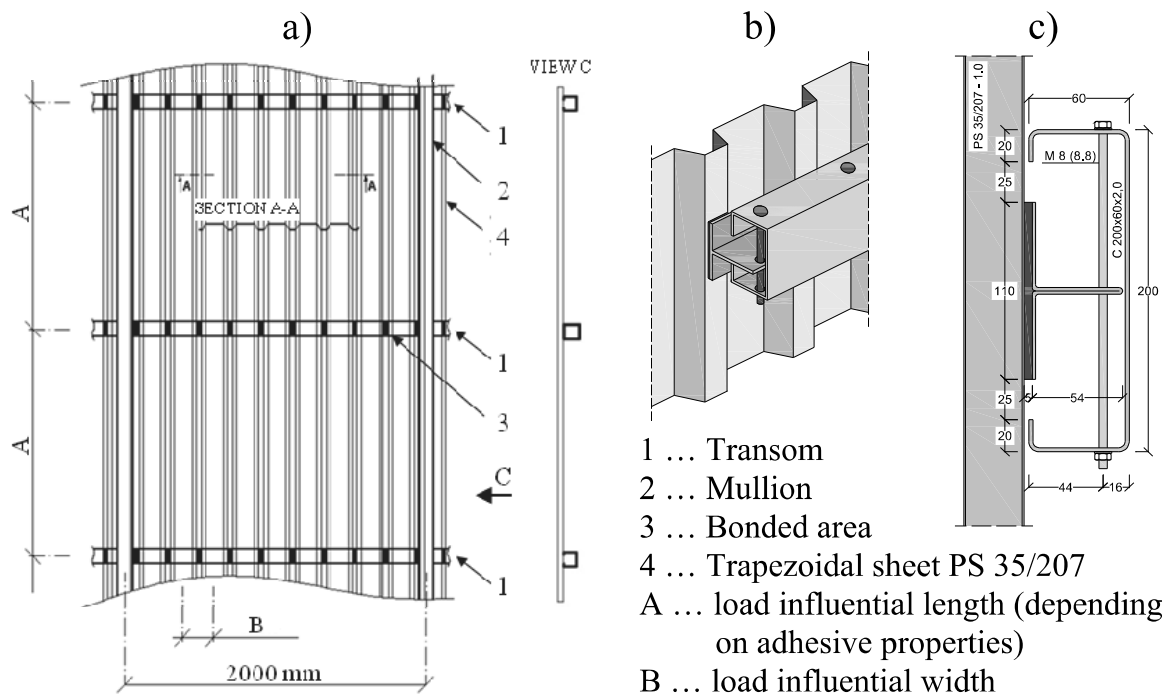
Façade with adhesively bonded connections: a) technical view; b) schematic figure; c) cross section normal to the longitudinal axis
